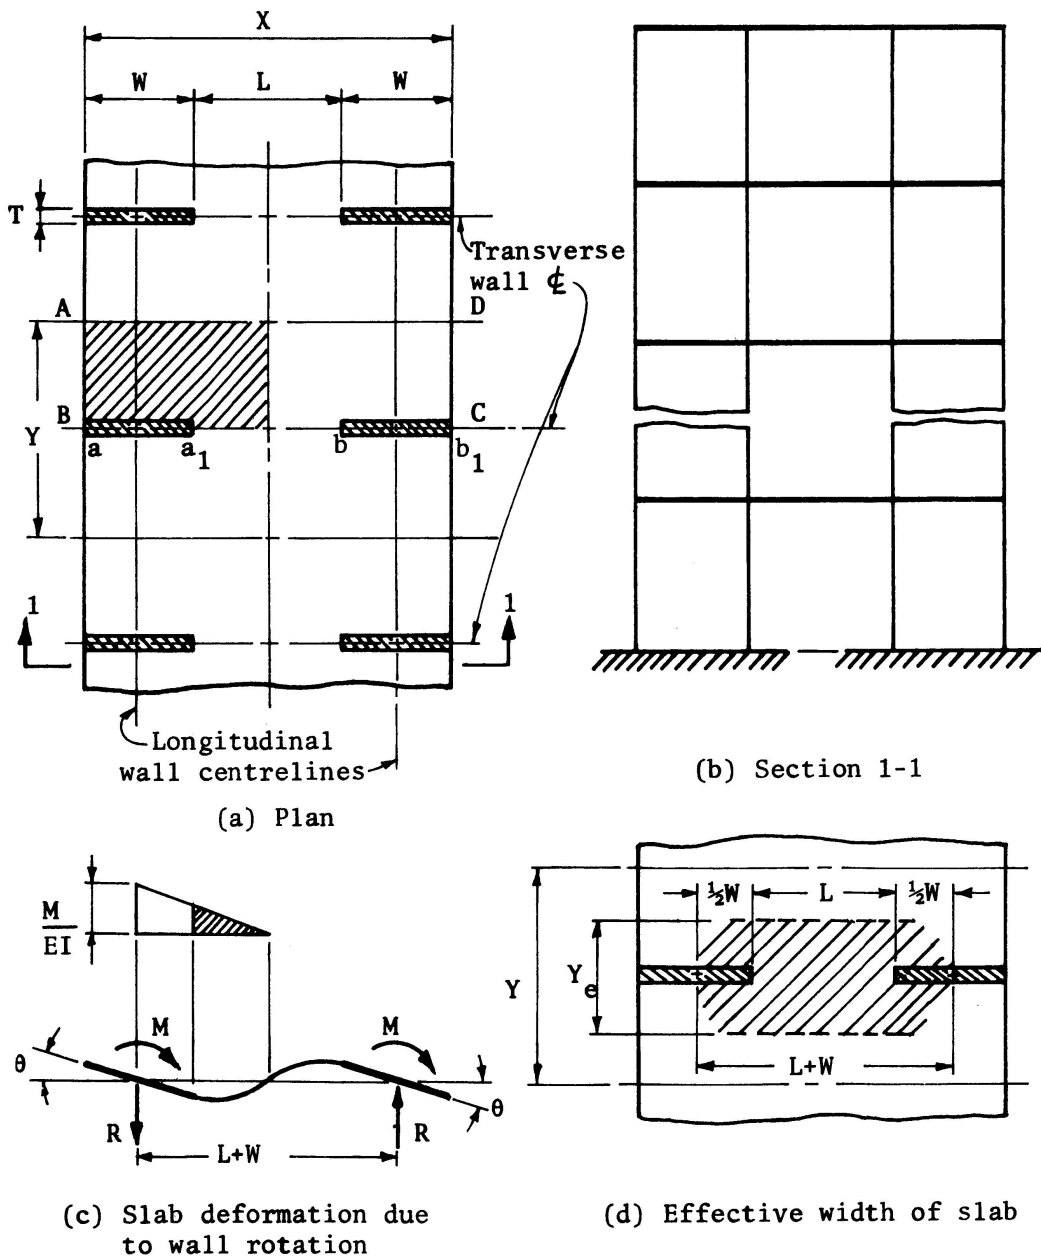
Slab and Cross Wall Structure and Wall Deformations.
